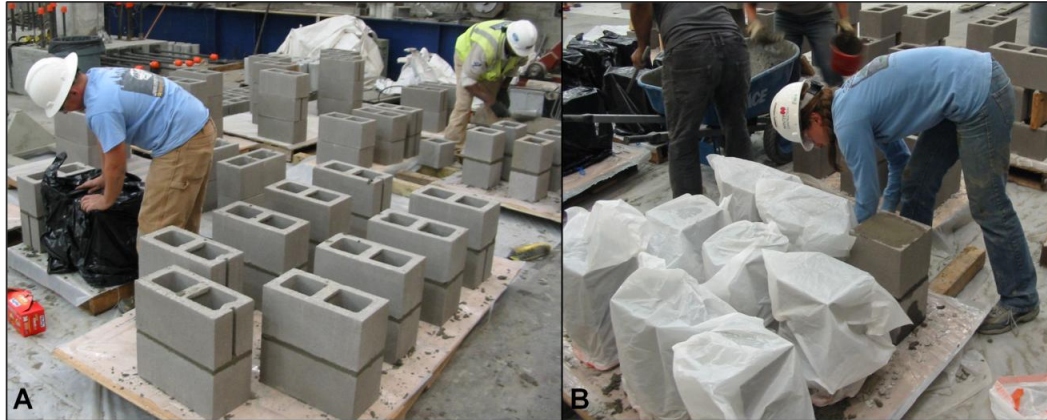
Constructing and bagging the (a) ungrouted prisms and (b) grouted prisms
